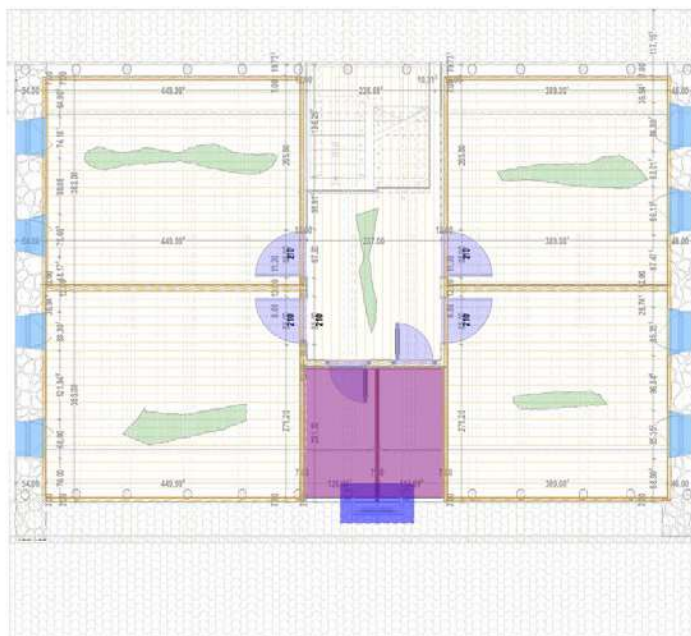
Building defects and history of interventions in the first floor of the building
